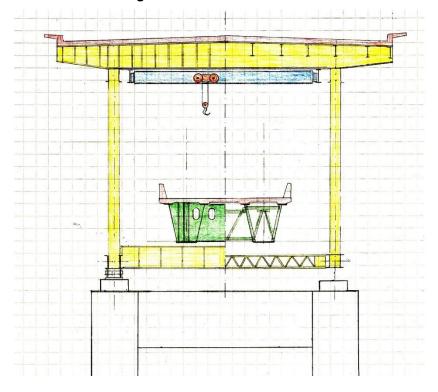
Image from Peter Taylor's conceptual schematic showing a cross-section of the new truss within the existing truss of IWMB.
